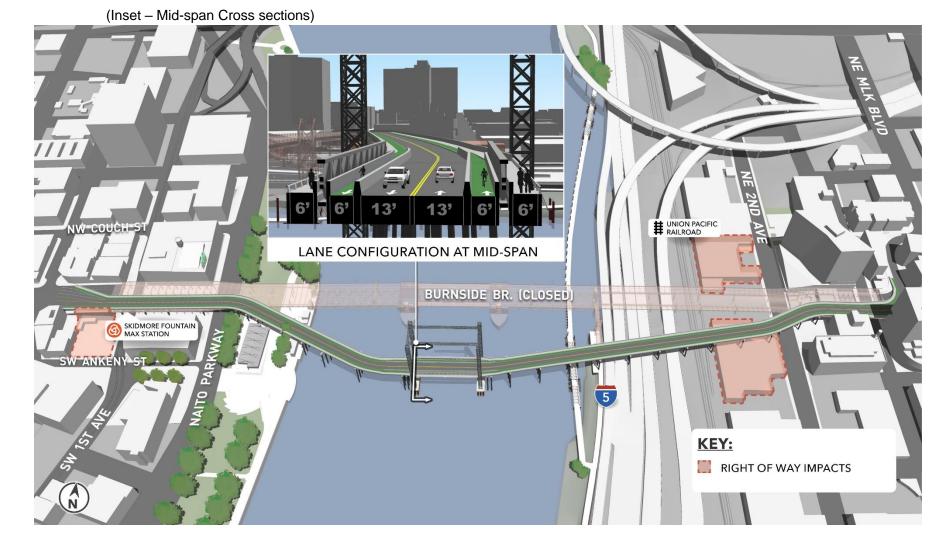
Temporary Detour Bridge Profile with Traffic (or Transit Only) – Aerial View
